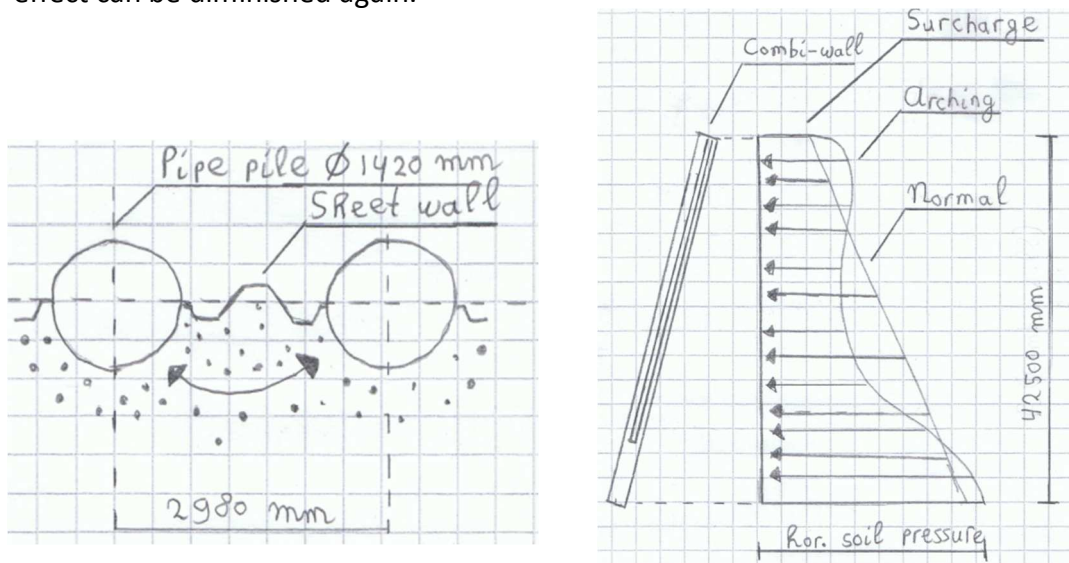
Left: horizontal 'umlagerung' on pipe pile elements shielding the sheet pile wall; right: vertical 'umlagerung' on combi-wall which shift the horizontal soil pressures to the ends of the combi-wall
